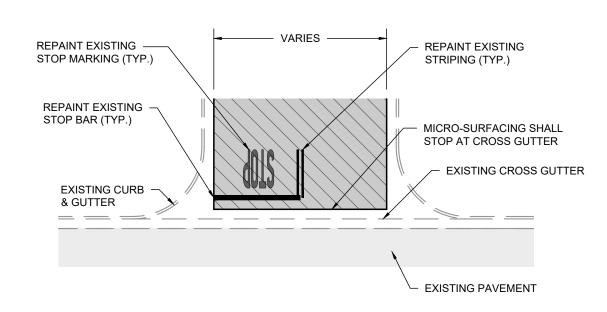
TYPICAL TRANSITION N.T.S.
